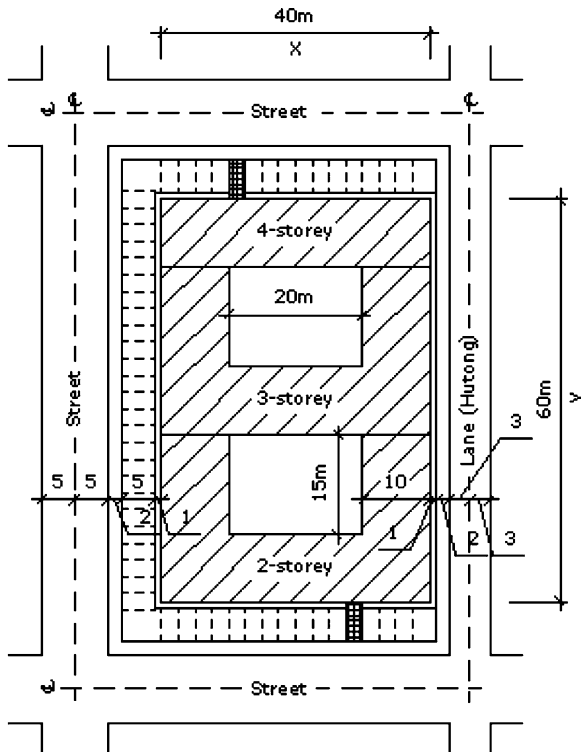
Model A: before enlargement. Not to scale, street: 10 m, lane: 6 m, pedestrian: 2 m, car park: 5 × 2.5 m, service route: 1 m.
